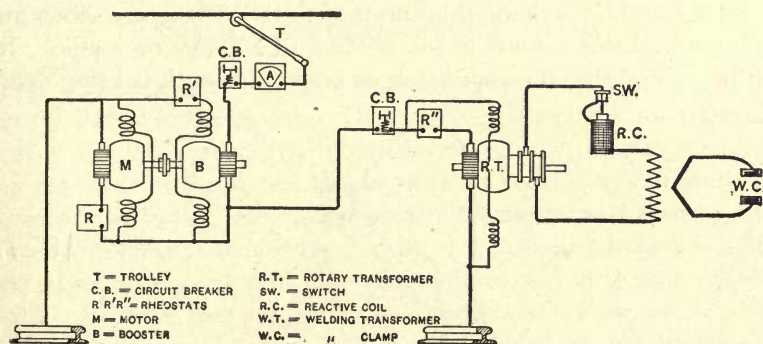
ELECTRIC RAIL WELDING.
